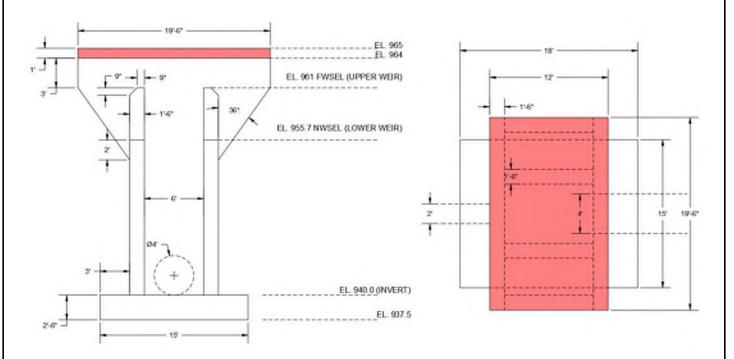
Intake Tower Plan/Elevation Sections and Top Slab (In Red)
